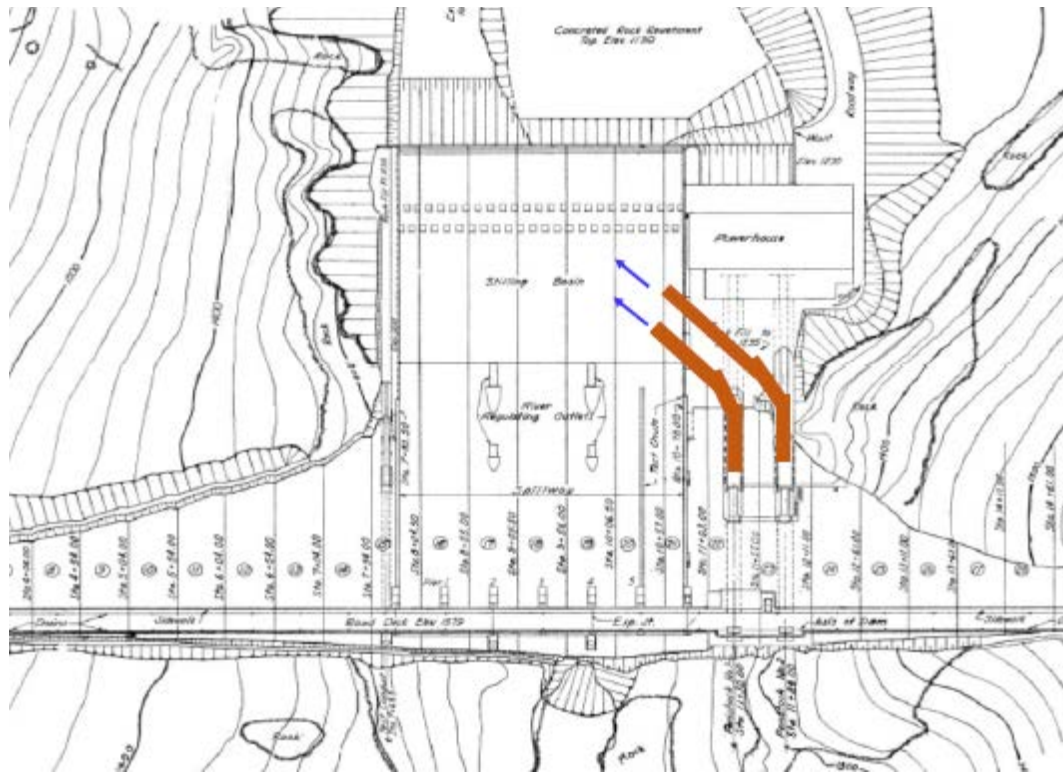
General Plan Schematic of RO – Penstock Bifurcation Conduit
